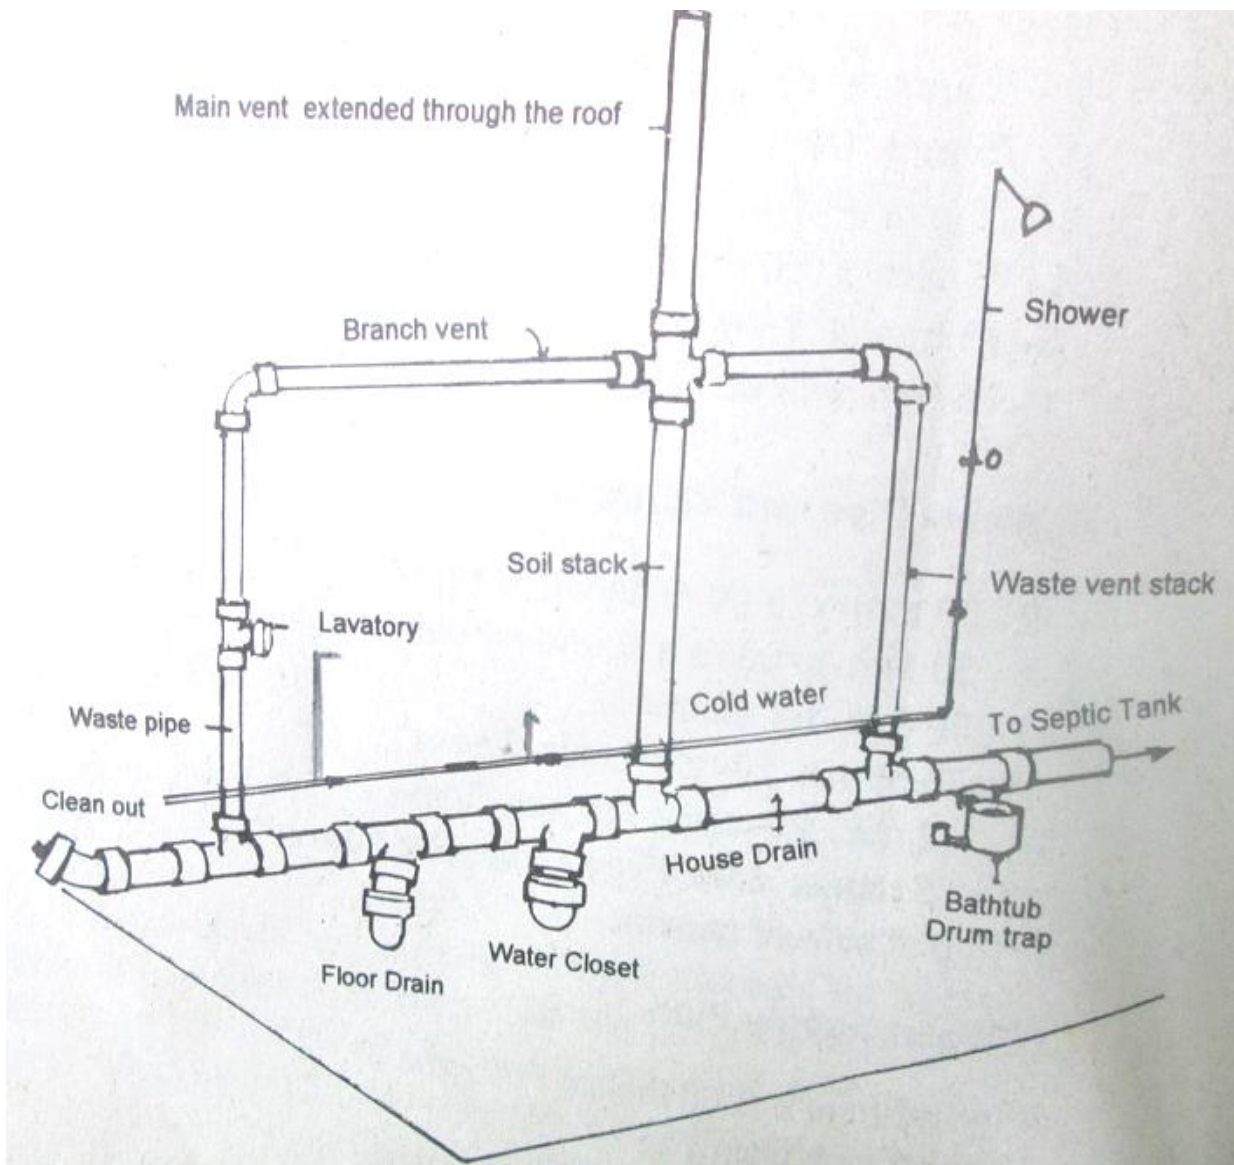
ISOMETRIC OF PLUMBING LAY -OUT
